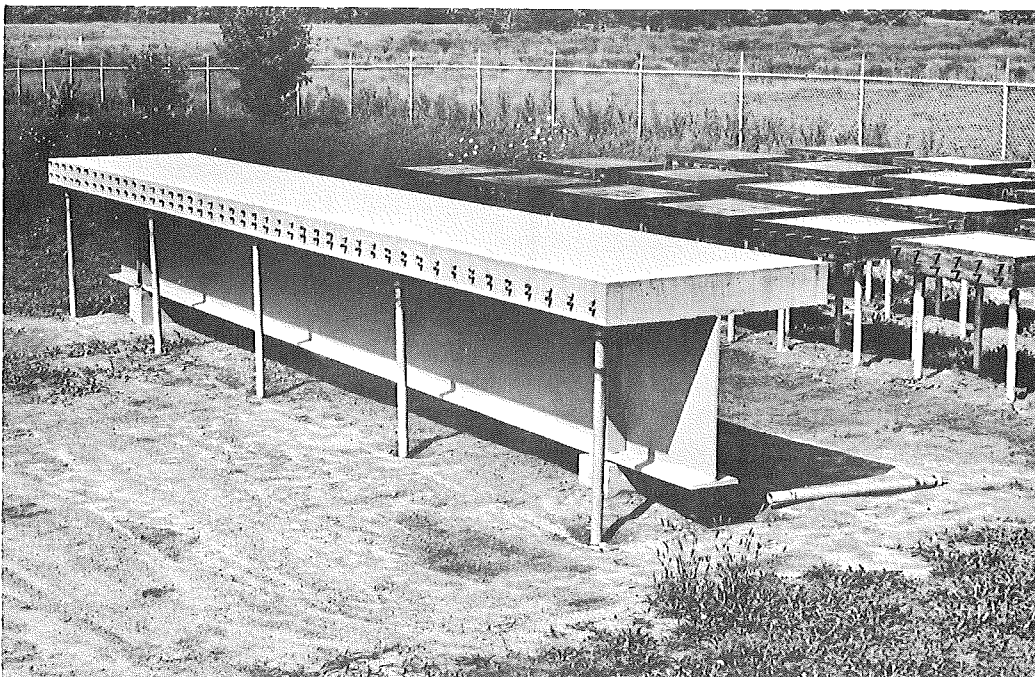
Field installation of laboratory specimens and simulated deck section. Water retaining dikes were added to the larger section at a later date.
